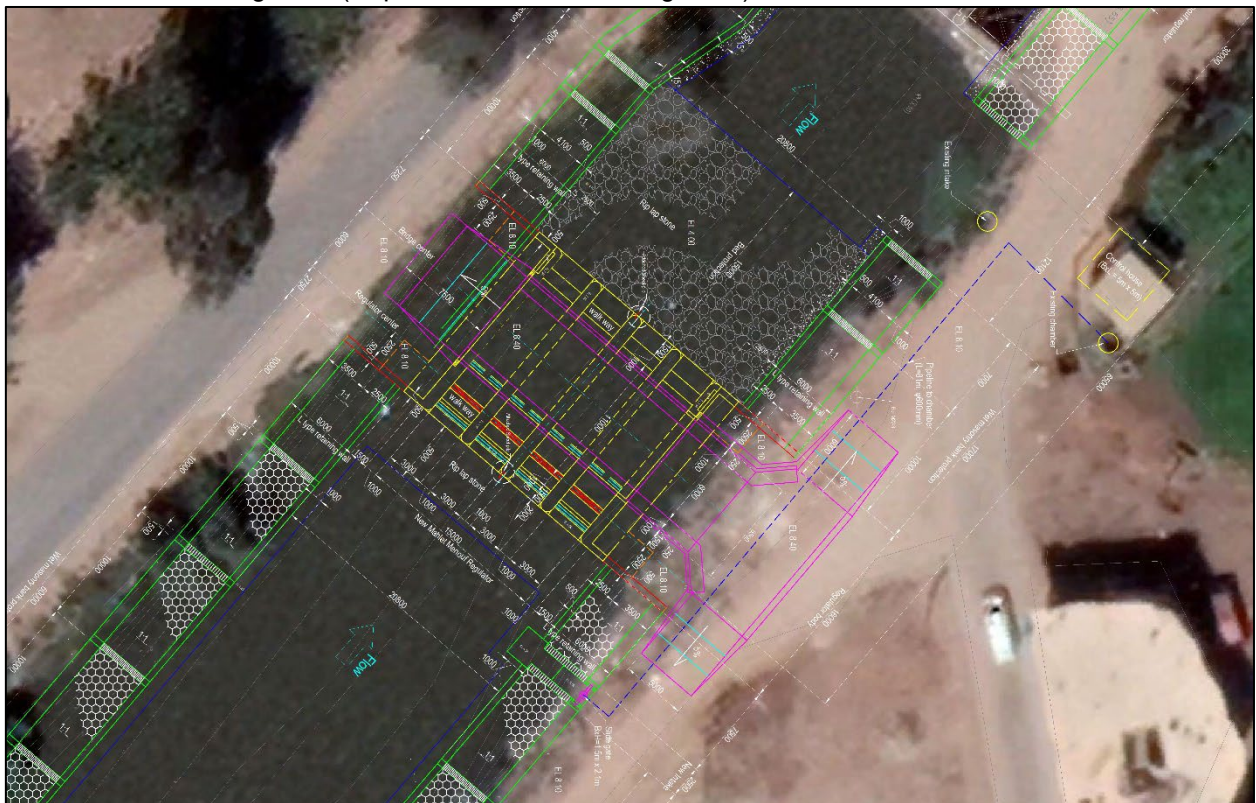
Plan of New Mahlet Menouf Regulator (New Construction)
